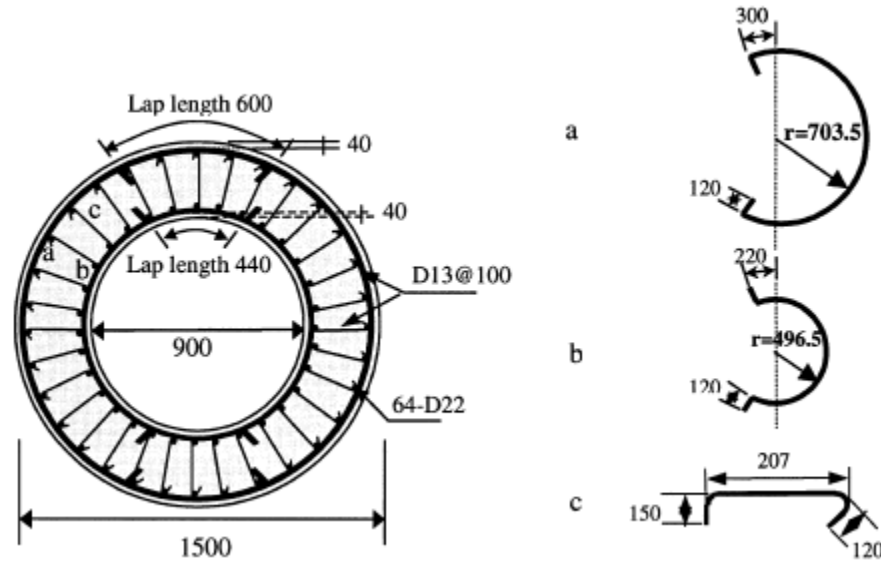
Cross-Section Dimensions and Lateral Reinforcement Details of Hollow Columns Tested by Yeh et al. (2001), (Dimensions in mm, 1 mm = 0.0394 inch)
